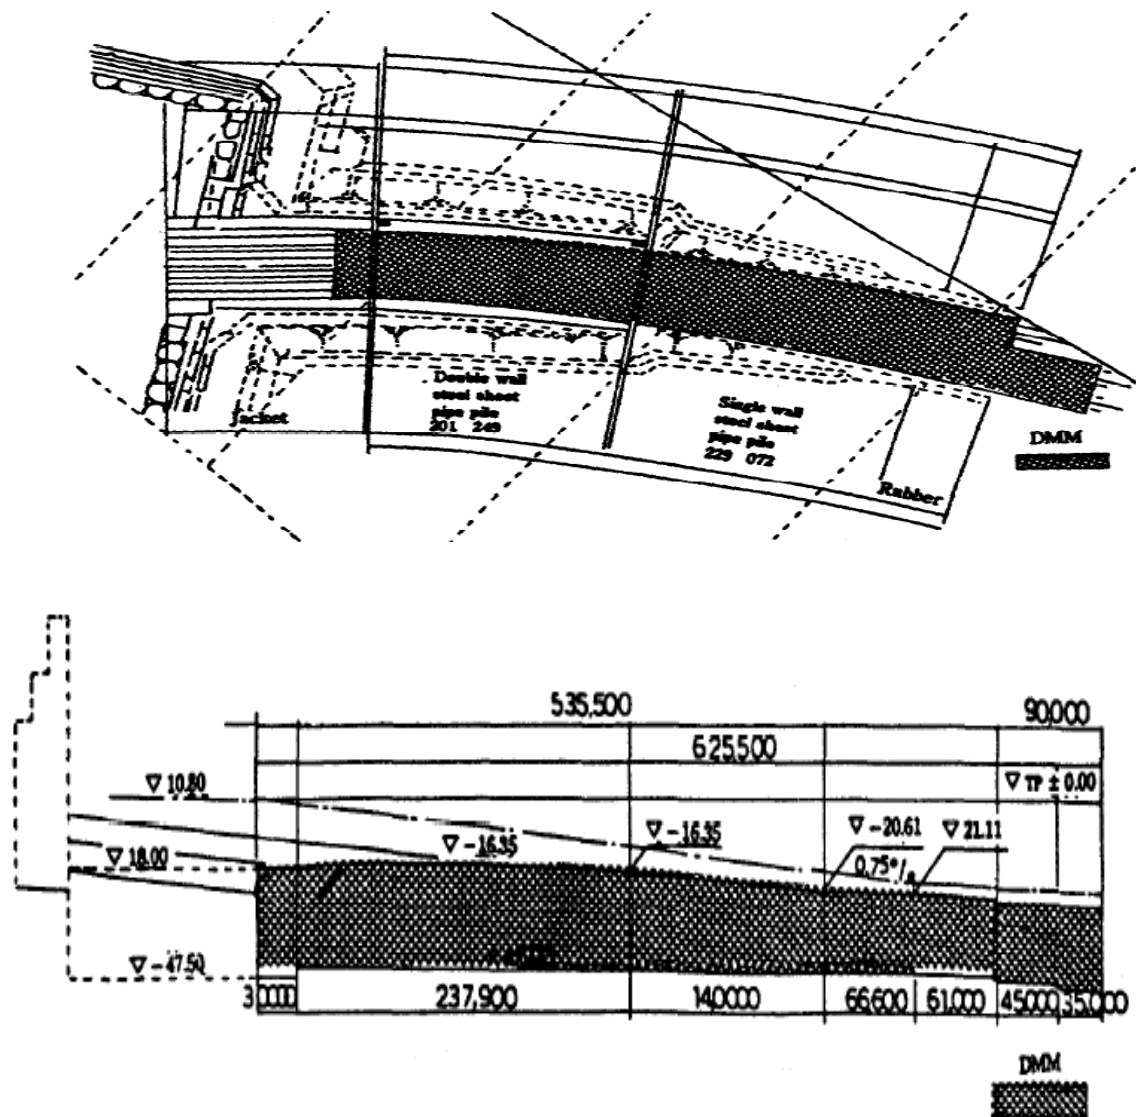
Plan of deep soil mixing method Tram Tokyo Bay Tunnel (Unami et d., 1996).
